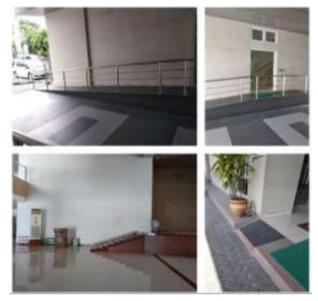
The Designs of Stairs, Ramps, and Railing in the Case of Different Floor Elevations at Aisyiyah University Campus (UNISA) (Pujianti, Munandar, and Surakusumah 2018)
